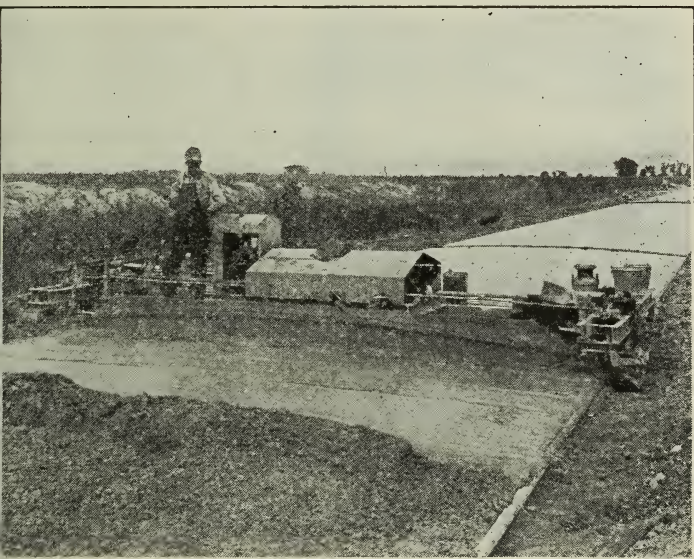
Mechanical finishing machine finishing surface of concrete pavement
